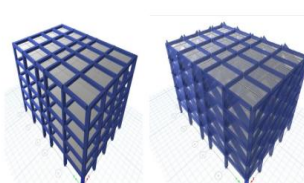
G+4 Building (Bare & Infilled Frame)
